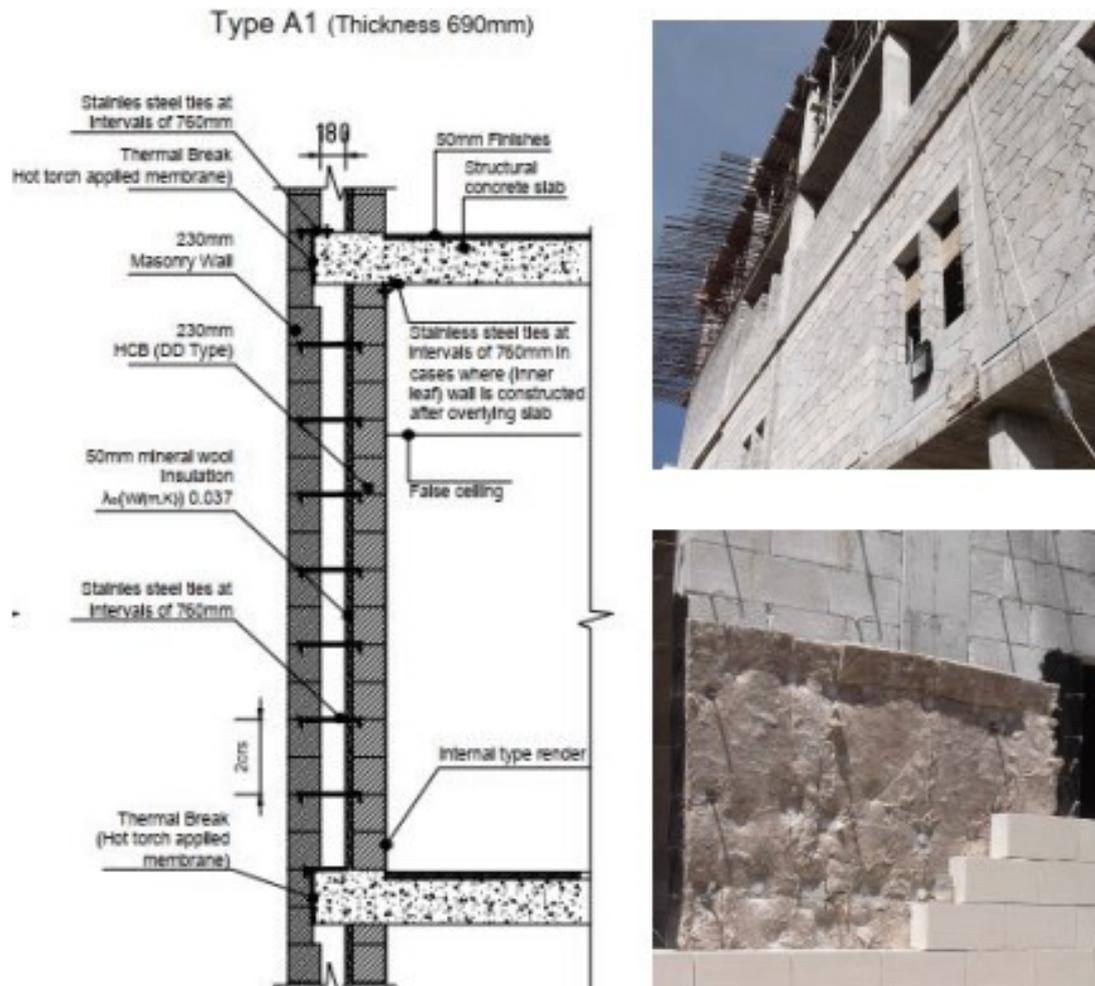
Details of double external walls with metal ties instead of bond stones [130]
